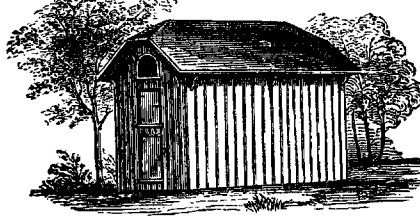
Ice-House, above Ground. One door is enough for common-sized houses.
